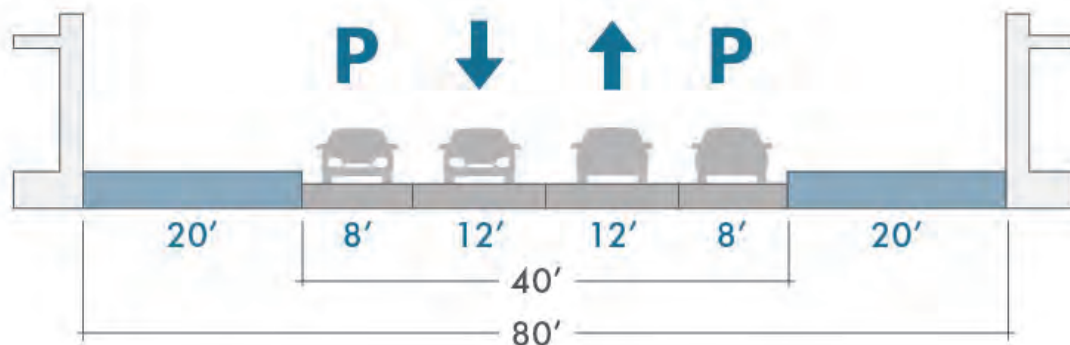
Pioneer Boulevard (186th to 187th) Existing Street Section
